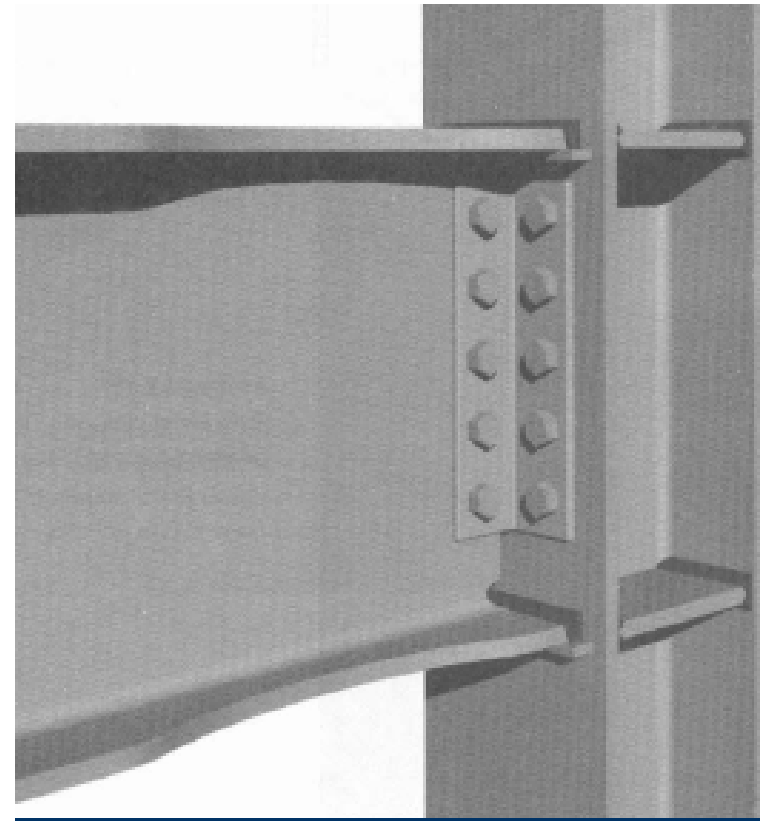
Spread and effective breadth in a welded and a bolted connection
